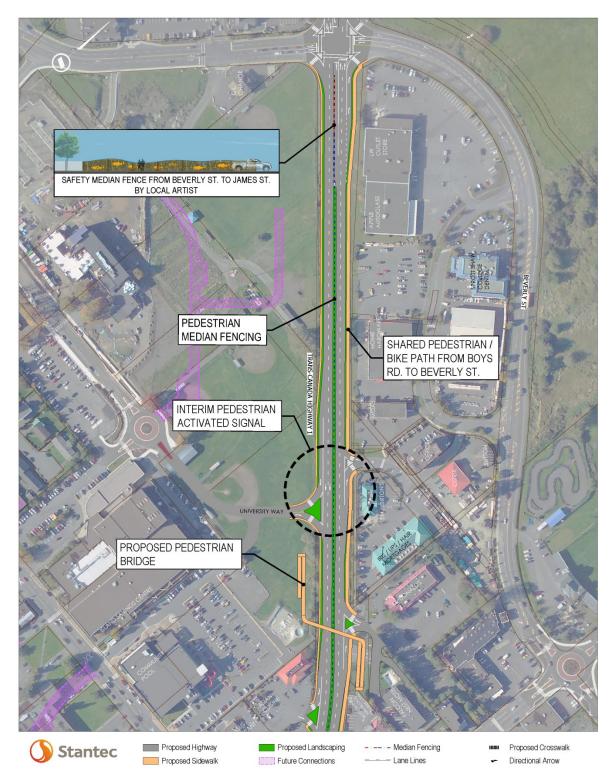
Long Term Transportation Plan–James St/York Rd to Beverly St
